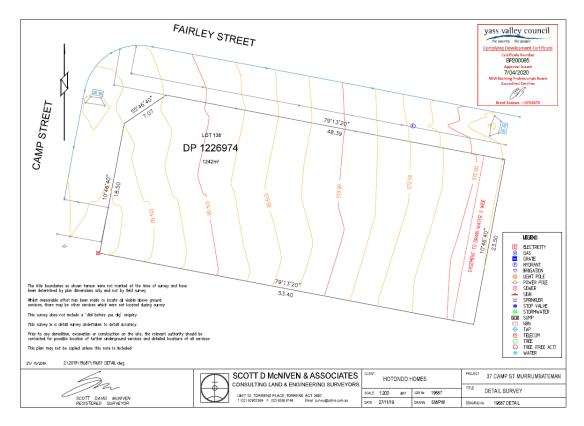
Approved Survey Plan with Contours (Source: Ashley Smith, September 2023)
